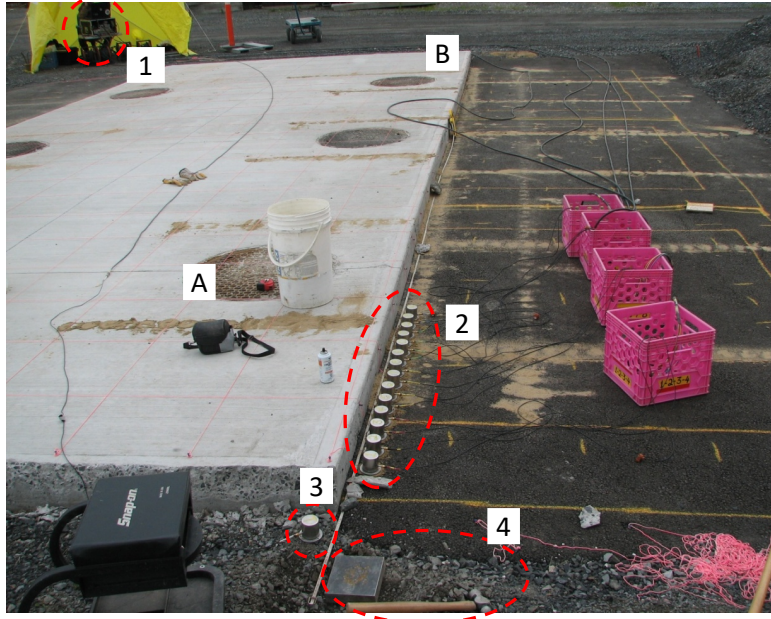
Typical field tests setup. 1: Acquisition System, 2: Accelerometers, 3: Trigger, 4: Impact source (hammer and metal plate). The manholes are visible on the surface of the concrete slab. (A-B) Location of the manholes of structure A and B.
